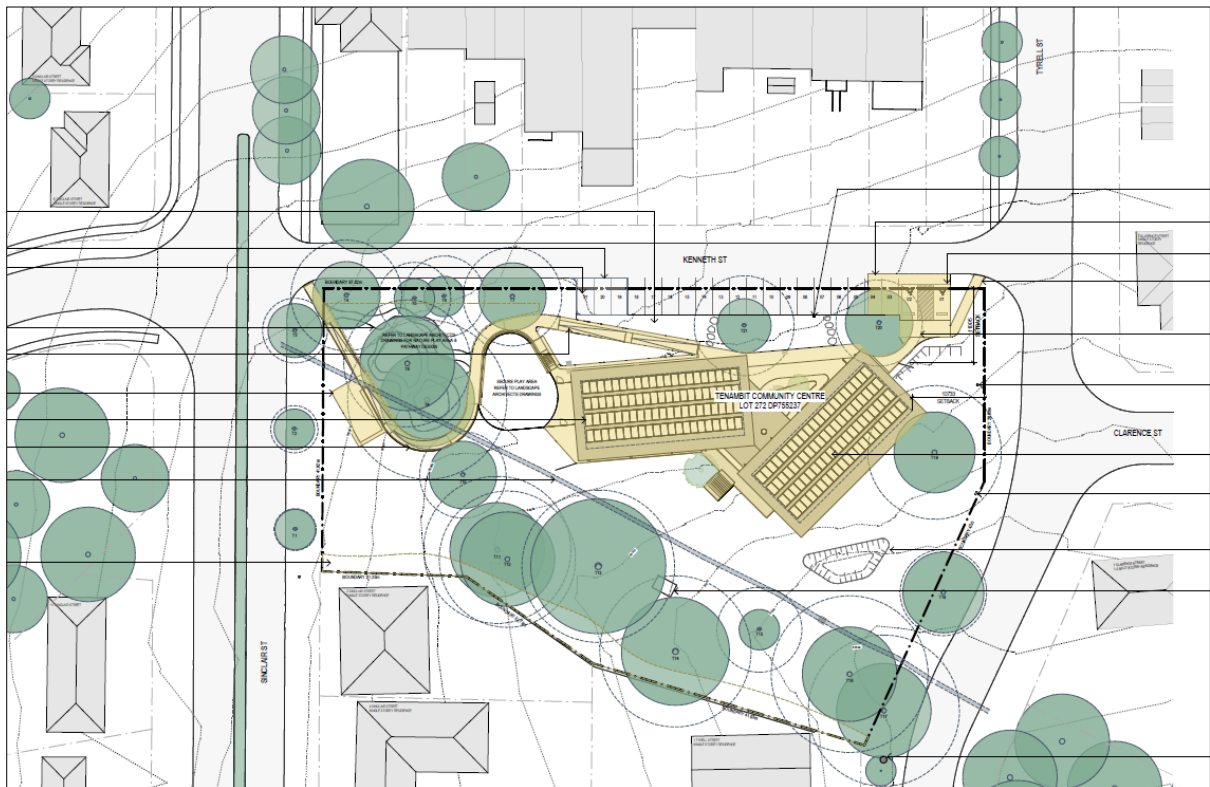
Overall Development Site Plan. Source: AJC Architects (April 2024)
